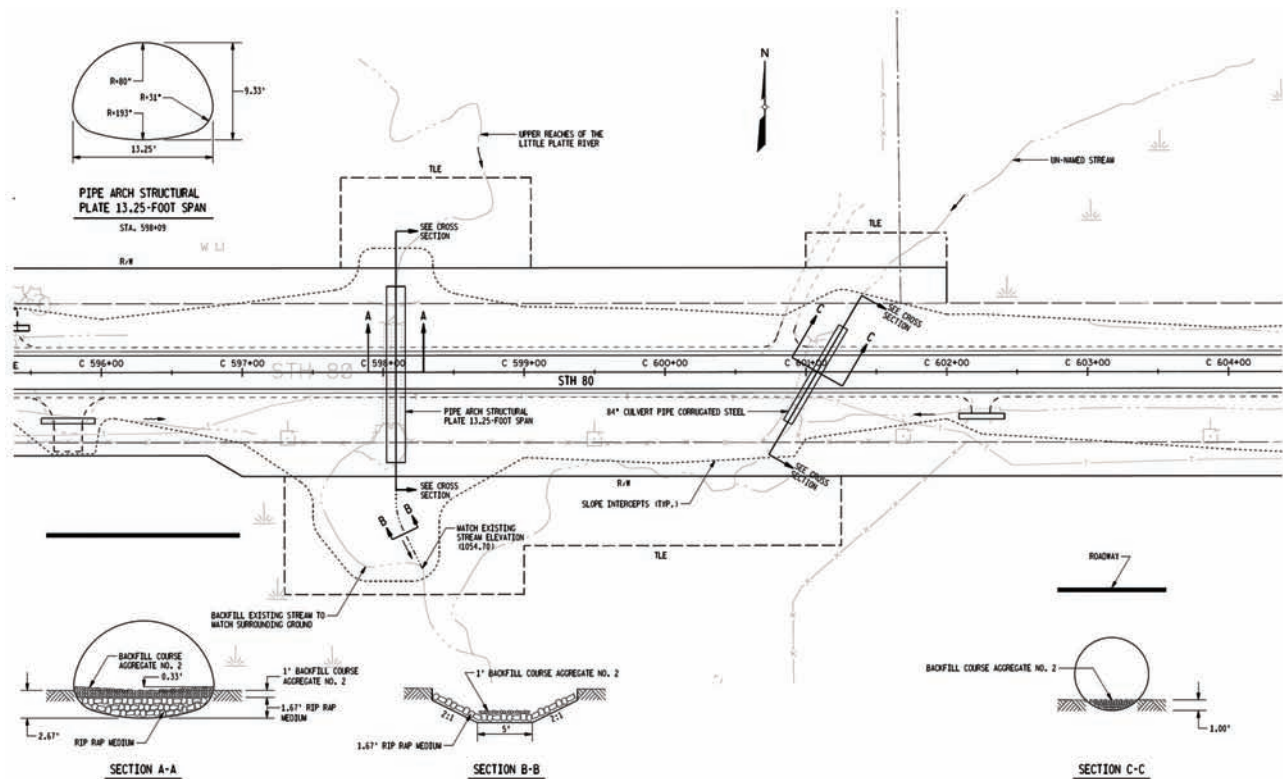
Engineering plan for replacement culvert(s) on STH80 over Little Platte River near Livingston, Wisconsin.
